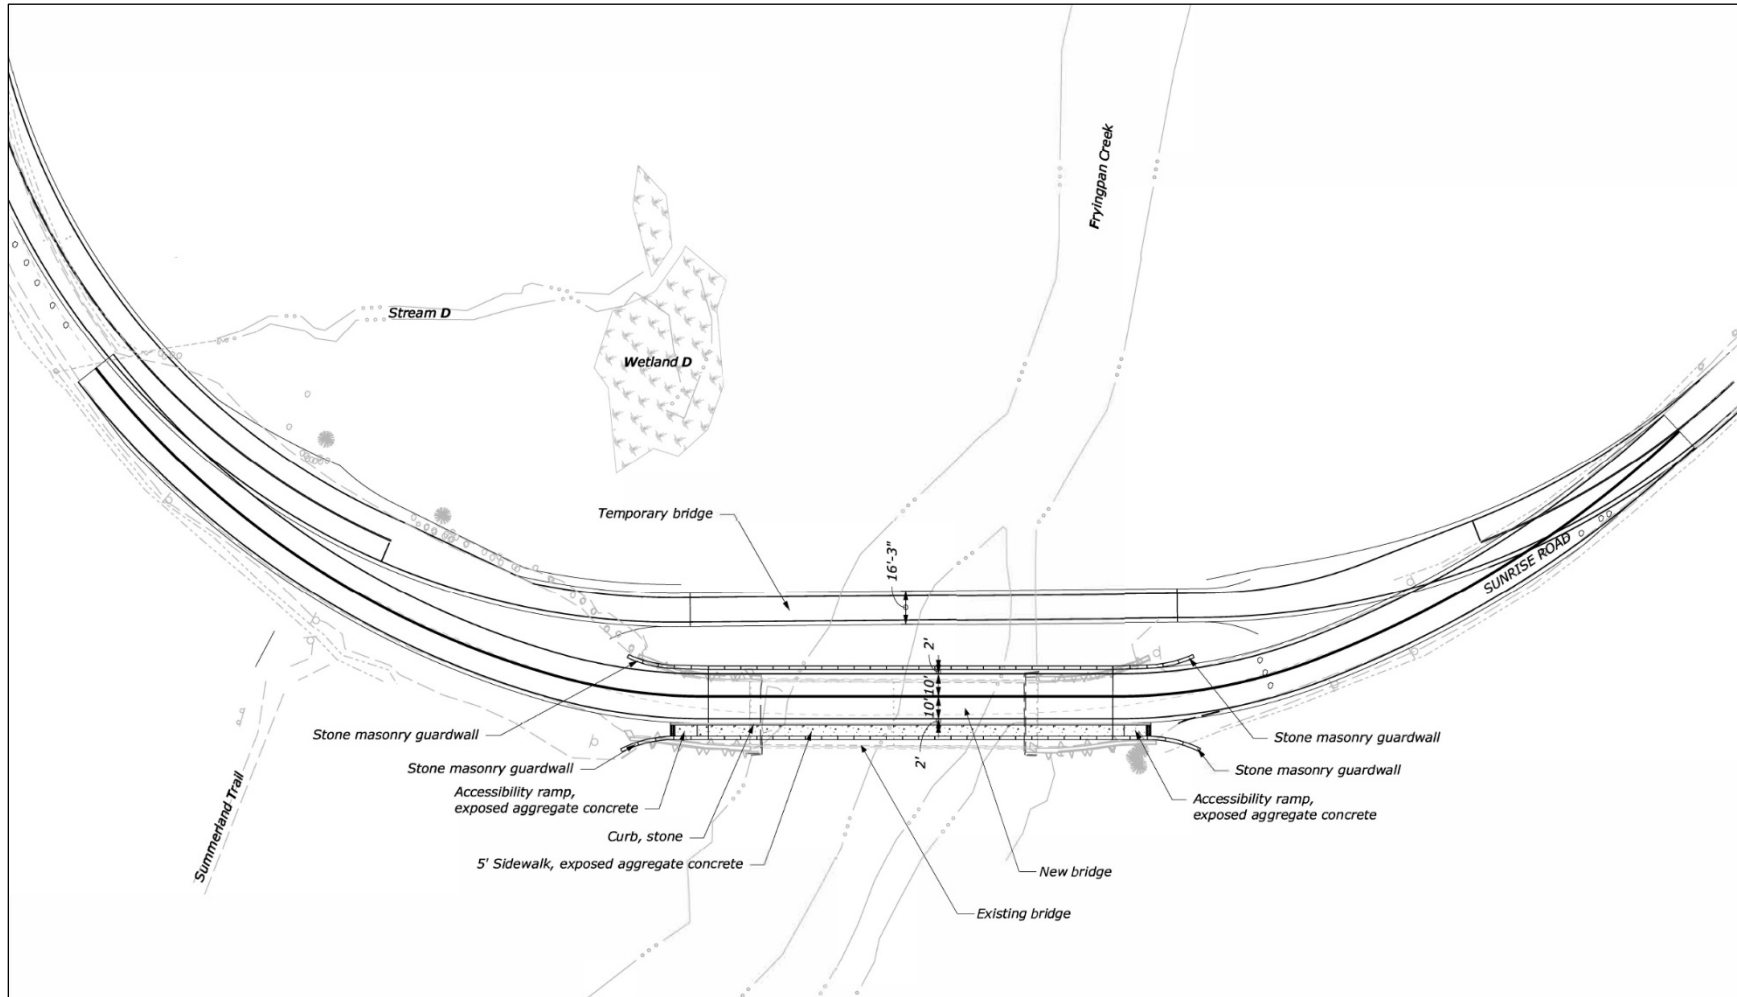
Rendering of the New Bridge under Alternative C – New Bridge on the Existing Alignment
